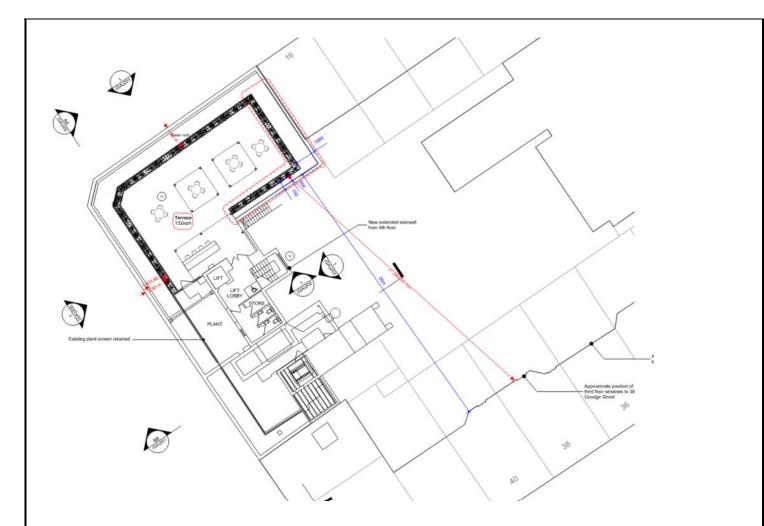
(above): Proposed 3rd floor plan with the new terrace outlined in red
